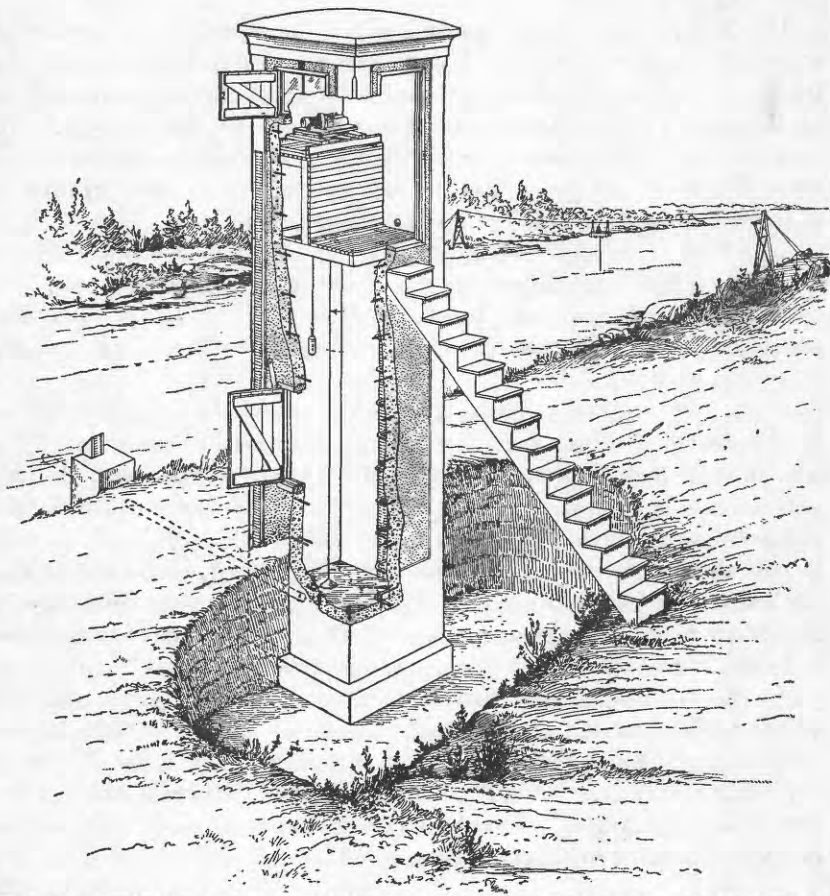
Typical river-measurement station showing concrete well and house for water-stage recorder and staff gages, cable, and car
